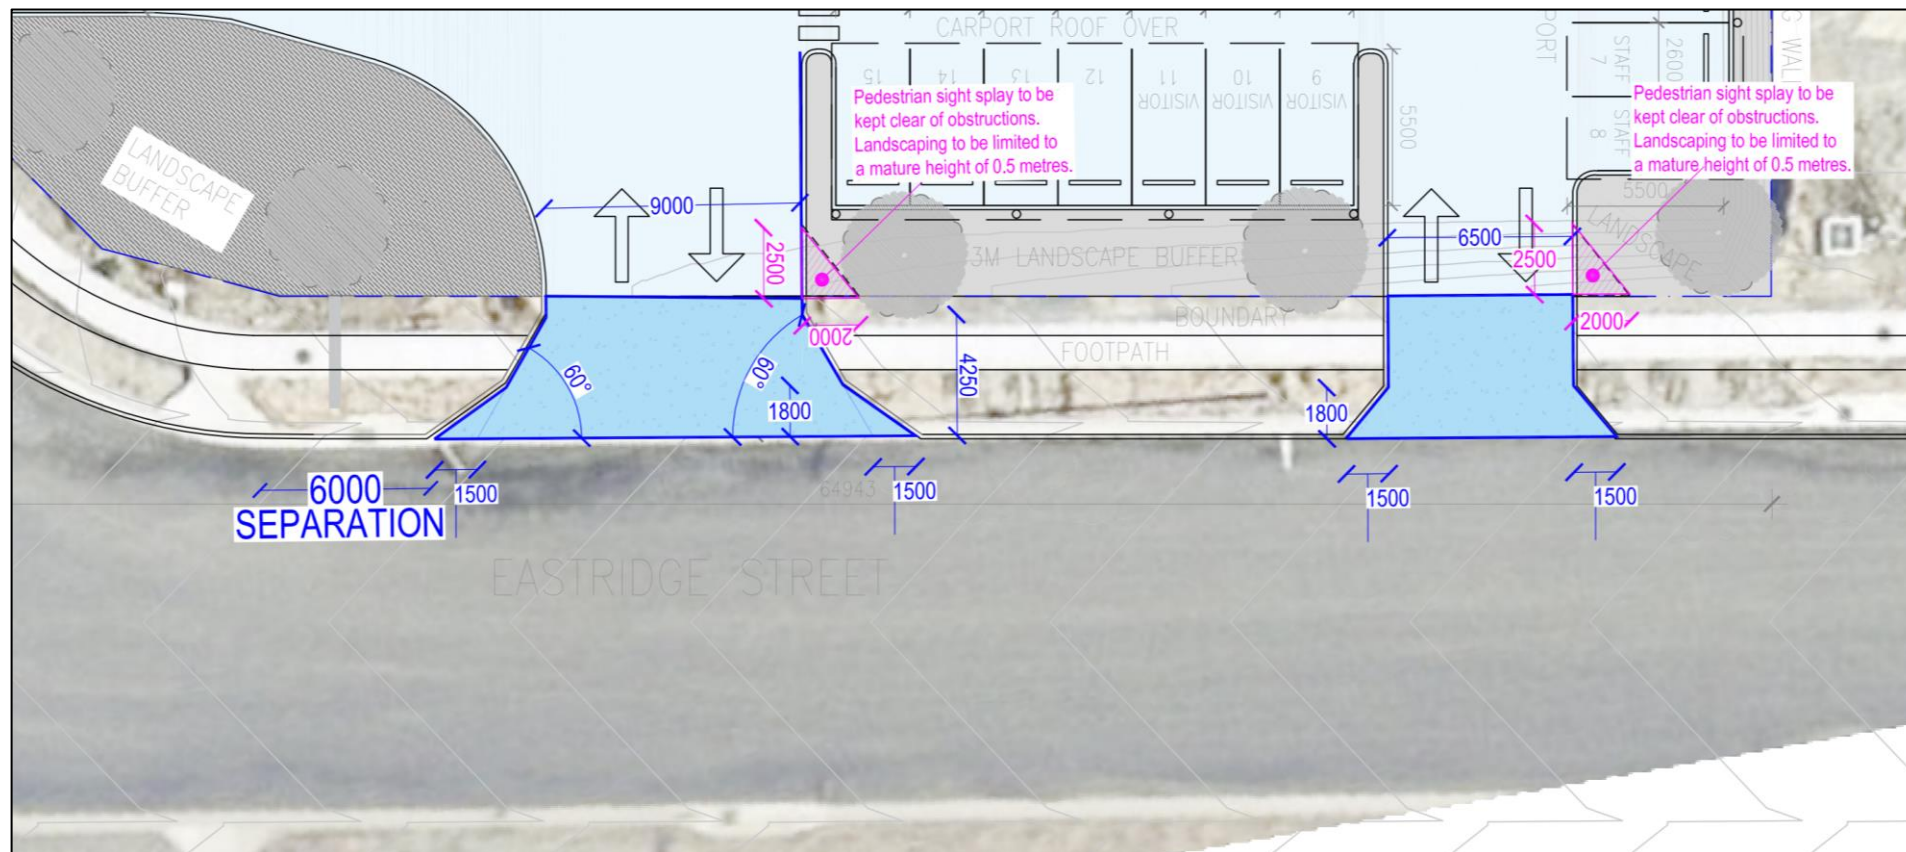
LIGHT AND HEAVY VEHICLE CROSSOVER ARRANGEMENTS (EASTRIDGE STREET CROSSOVERS)
